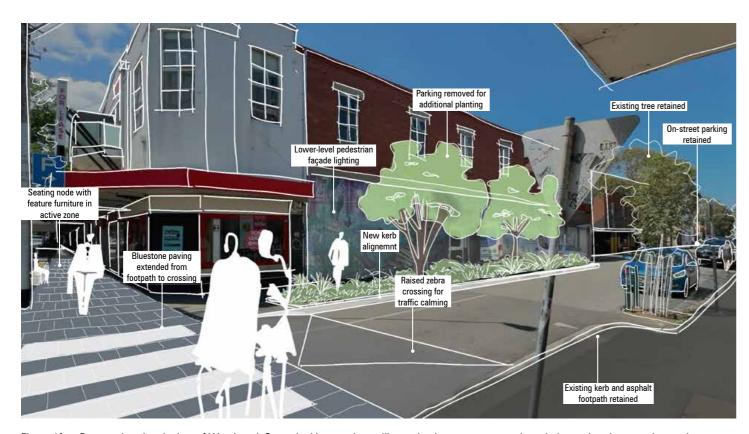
Perspective sketch view of Woodstock Street looking southeast illustrating improvements to the existing pedestrian crossing to slow vehicles upon approach with level change and a change in surface material and texture. Corner build-outs allow for new street tree planting, and footpath widening maintains pedestrian circulation with additional space for footpath activation and garden beds.
